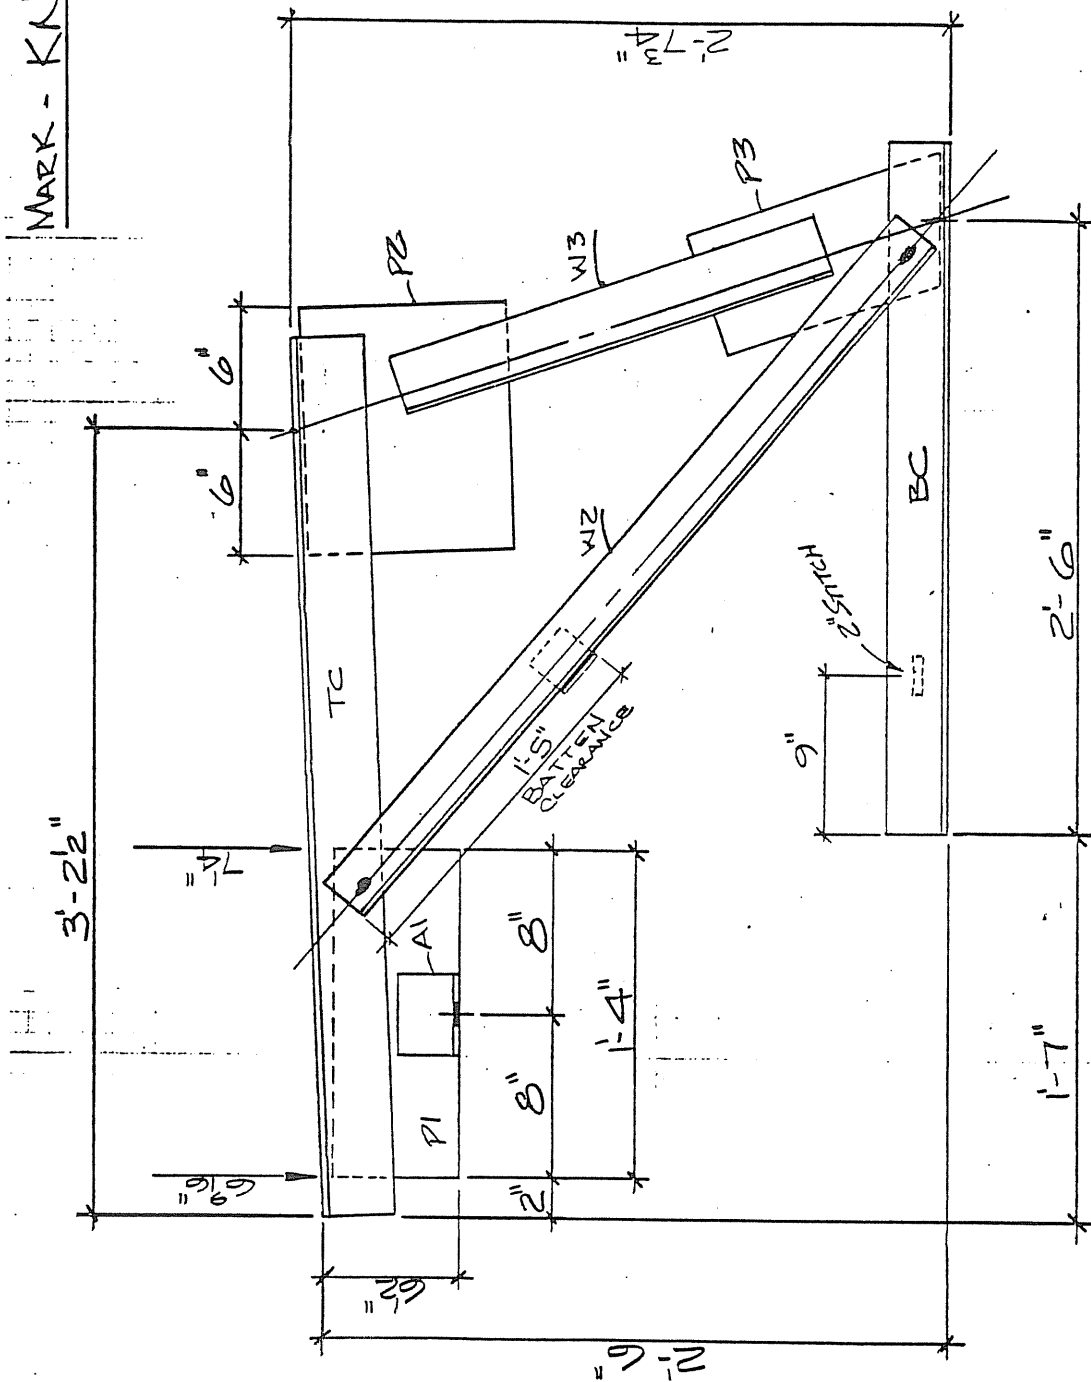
KNEE CONNECTION DETAIL, TEST KN-1-2
